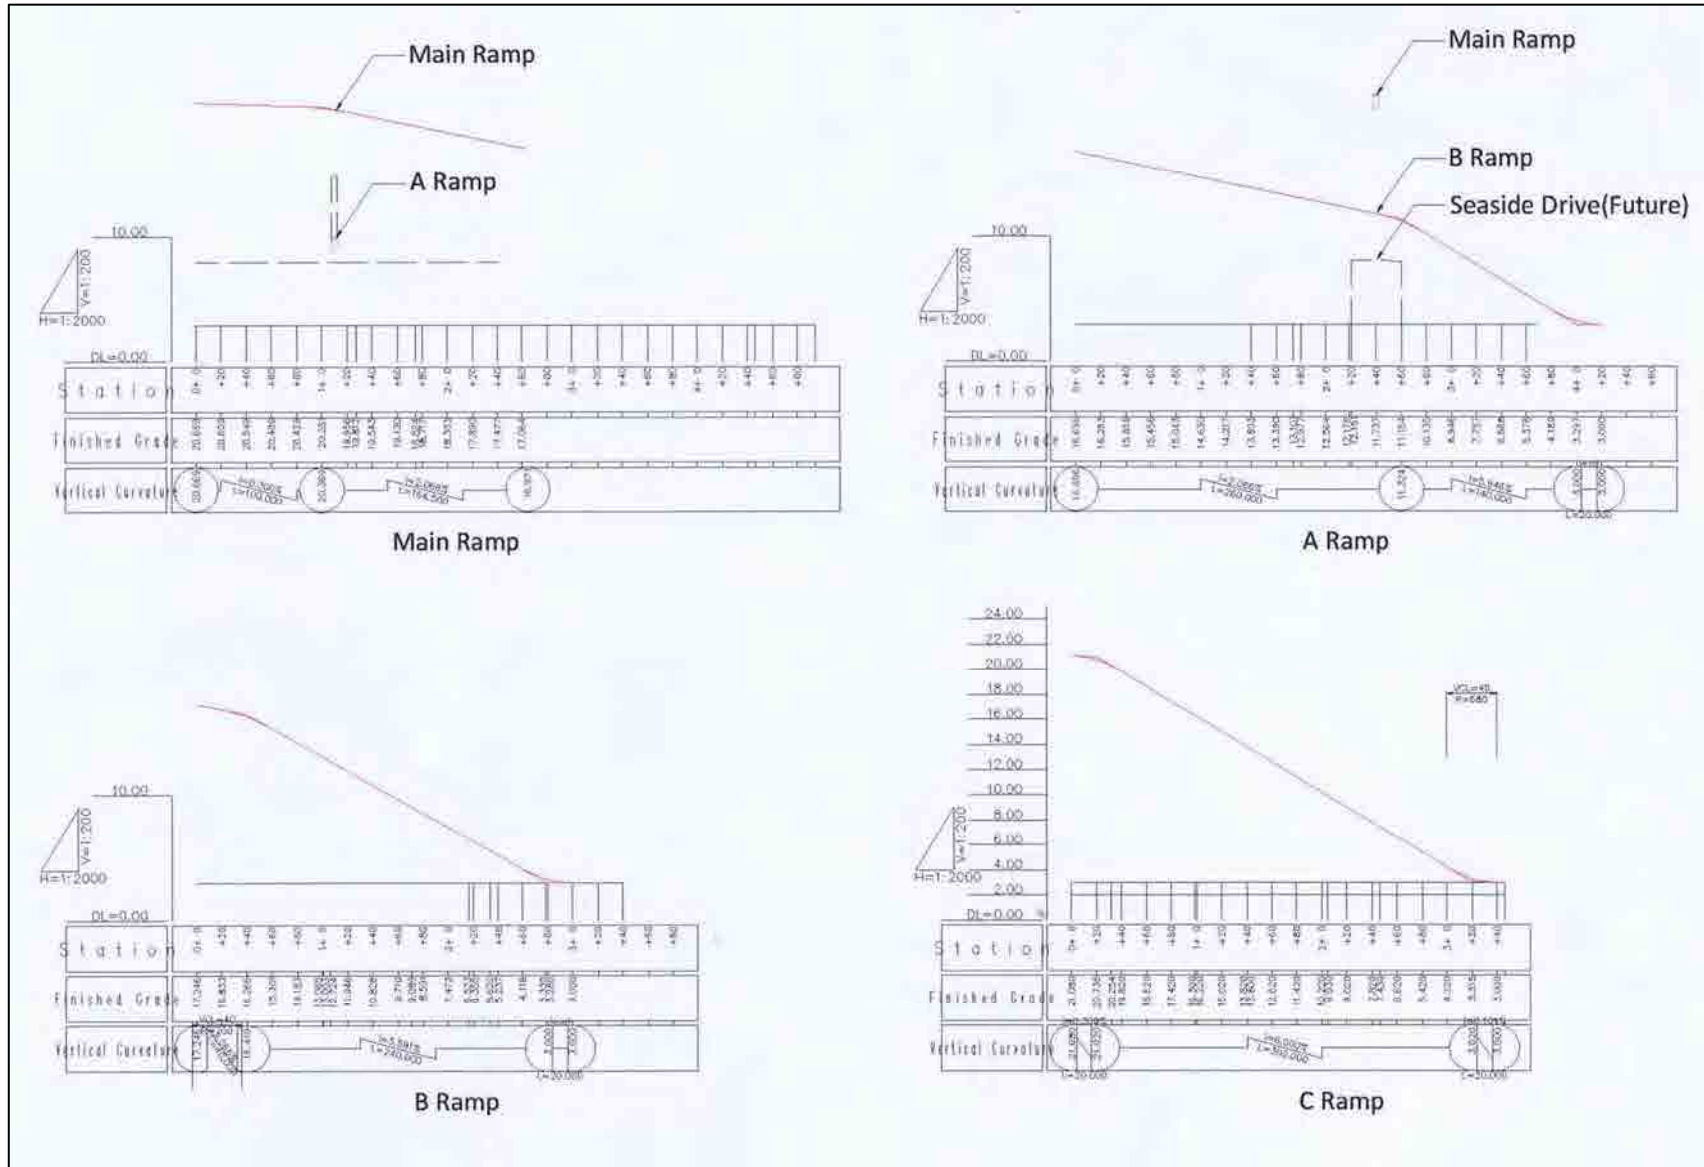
(3) ALTERNATIVE-1(B) INTERCHANGE PLAN END AT MACAPAGAL BLVD (PROFILE)
